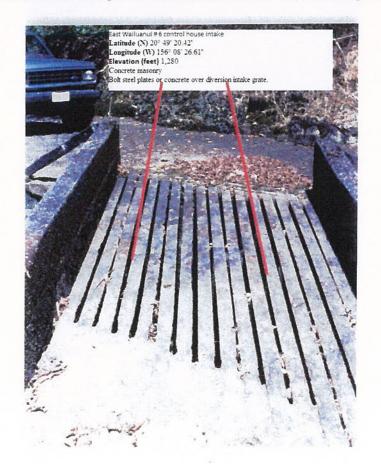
(above): East Wailuanui at Koolau Ditch (K-18)
